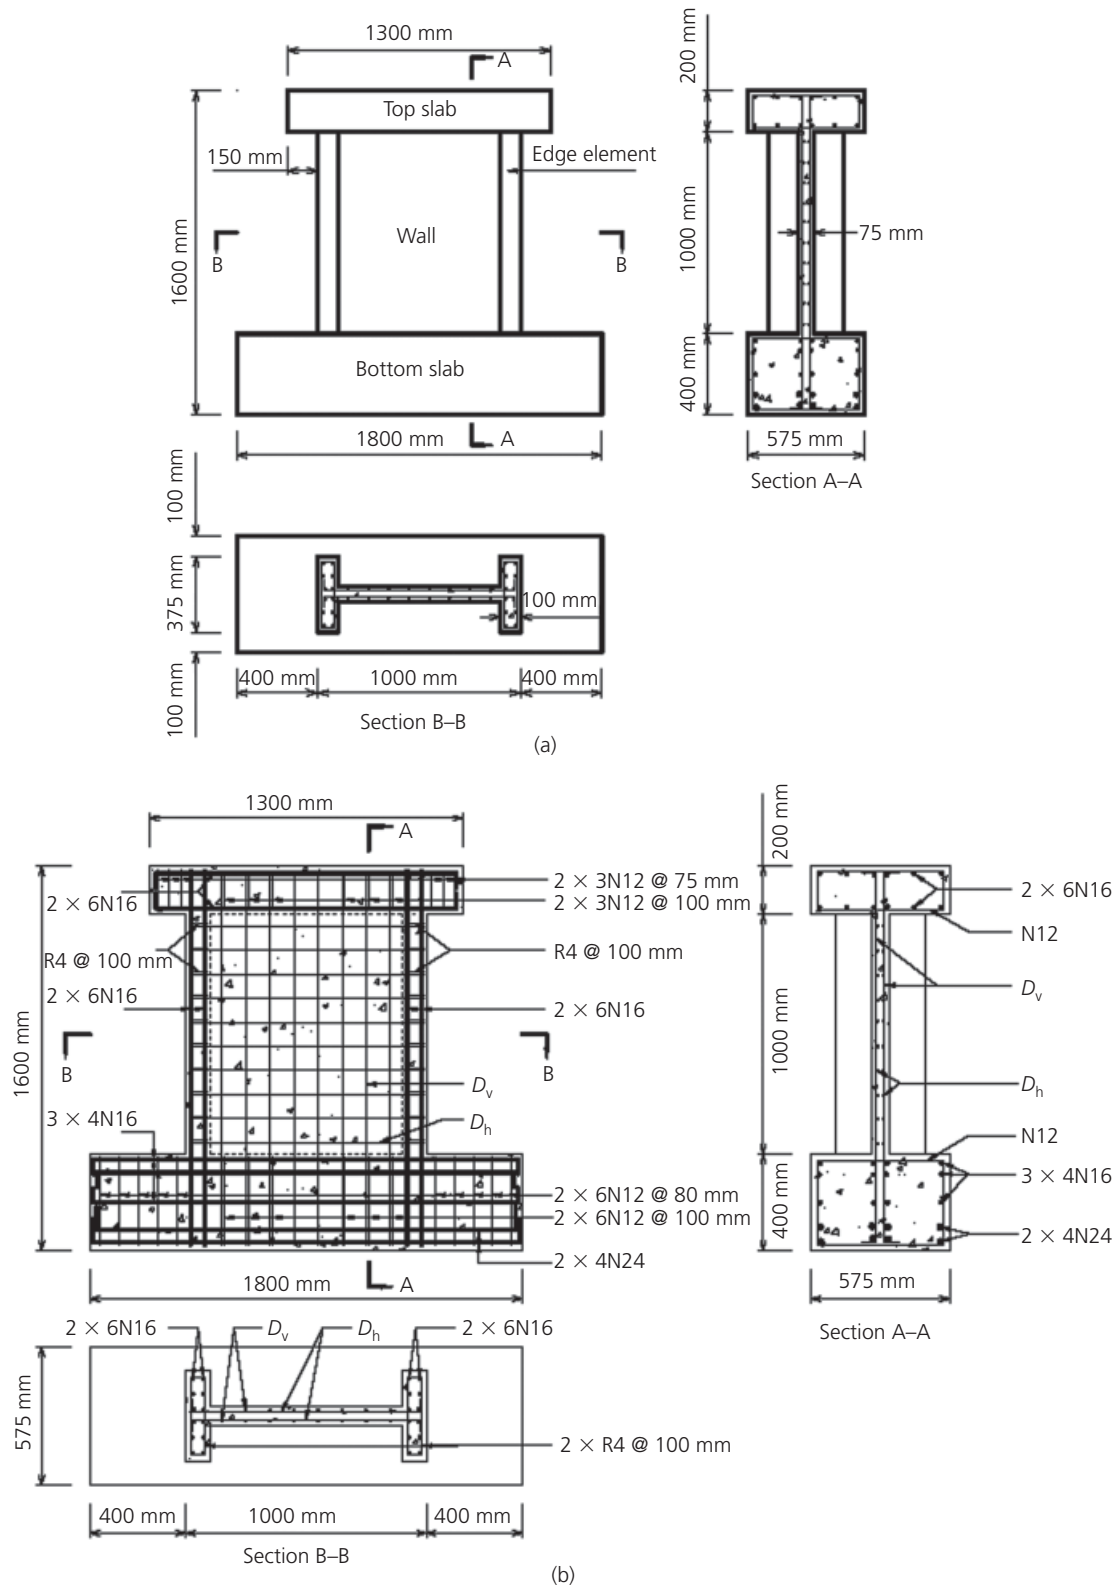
(a) Dimensions of wall specimens; (b) reinforcement details of shear wall specimens (Dabbagh, 2006)
